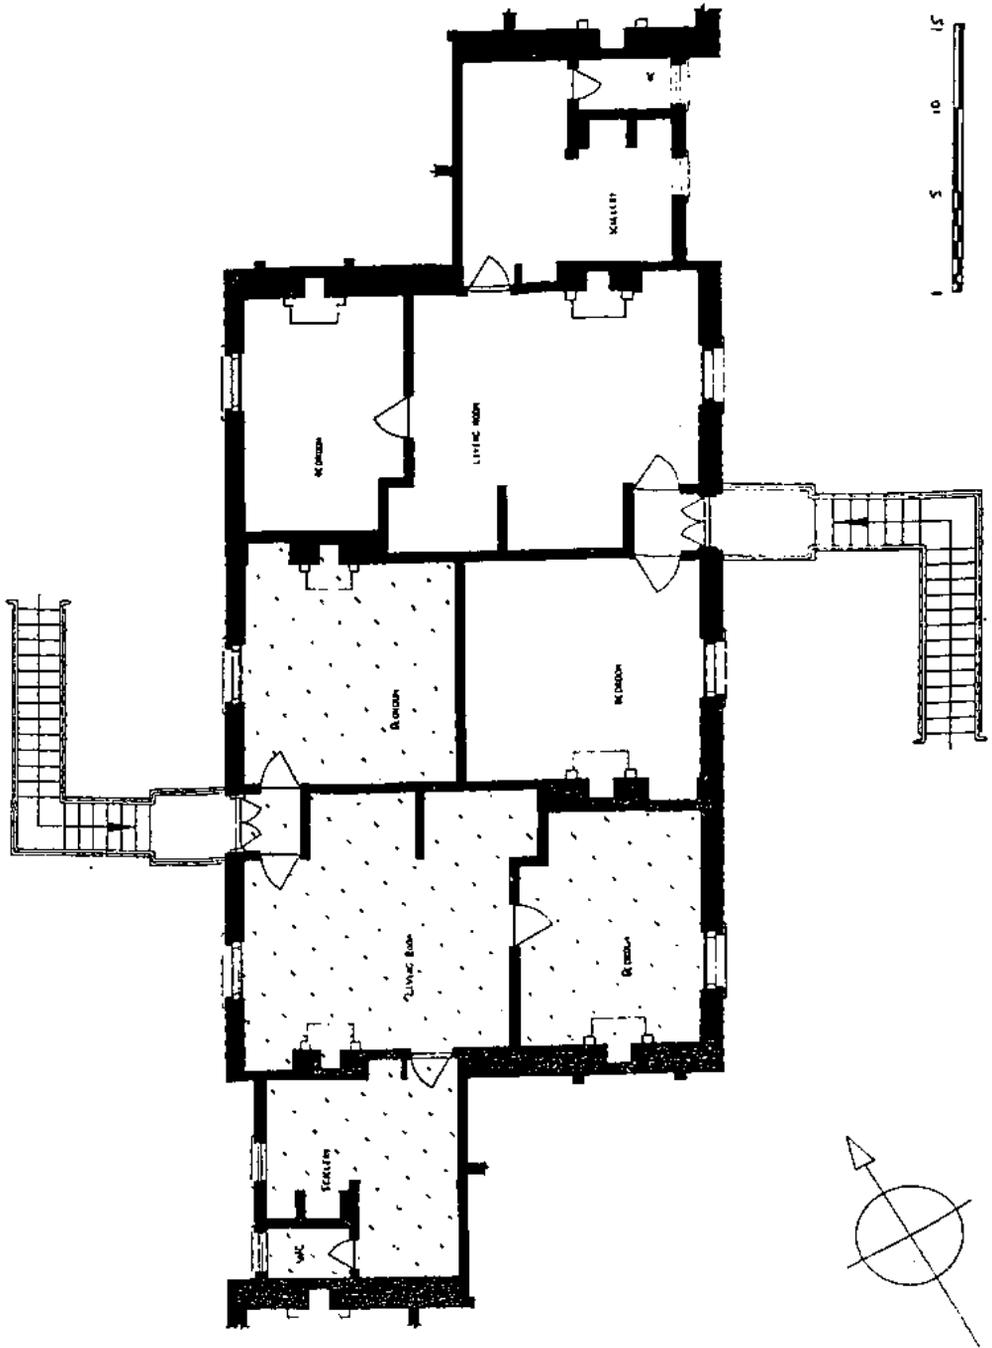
First floor flat plans. Nos. 202 Dee Street (facing north west) and 192 Dee Street (facing south east) Denbeath.
